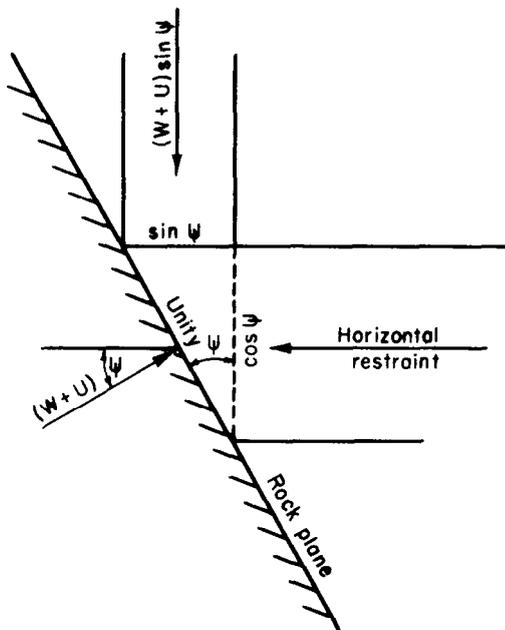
Force normal to an inclined abutment plane. -DS2-2(49)
